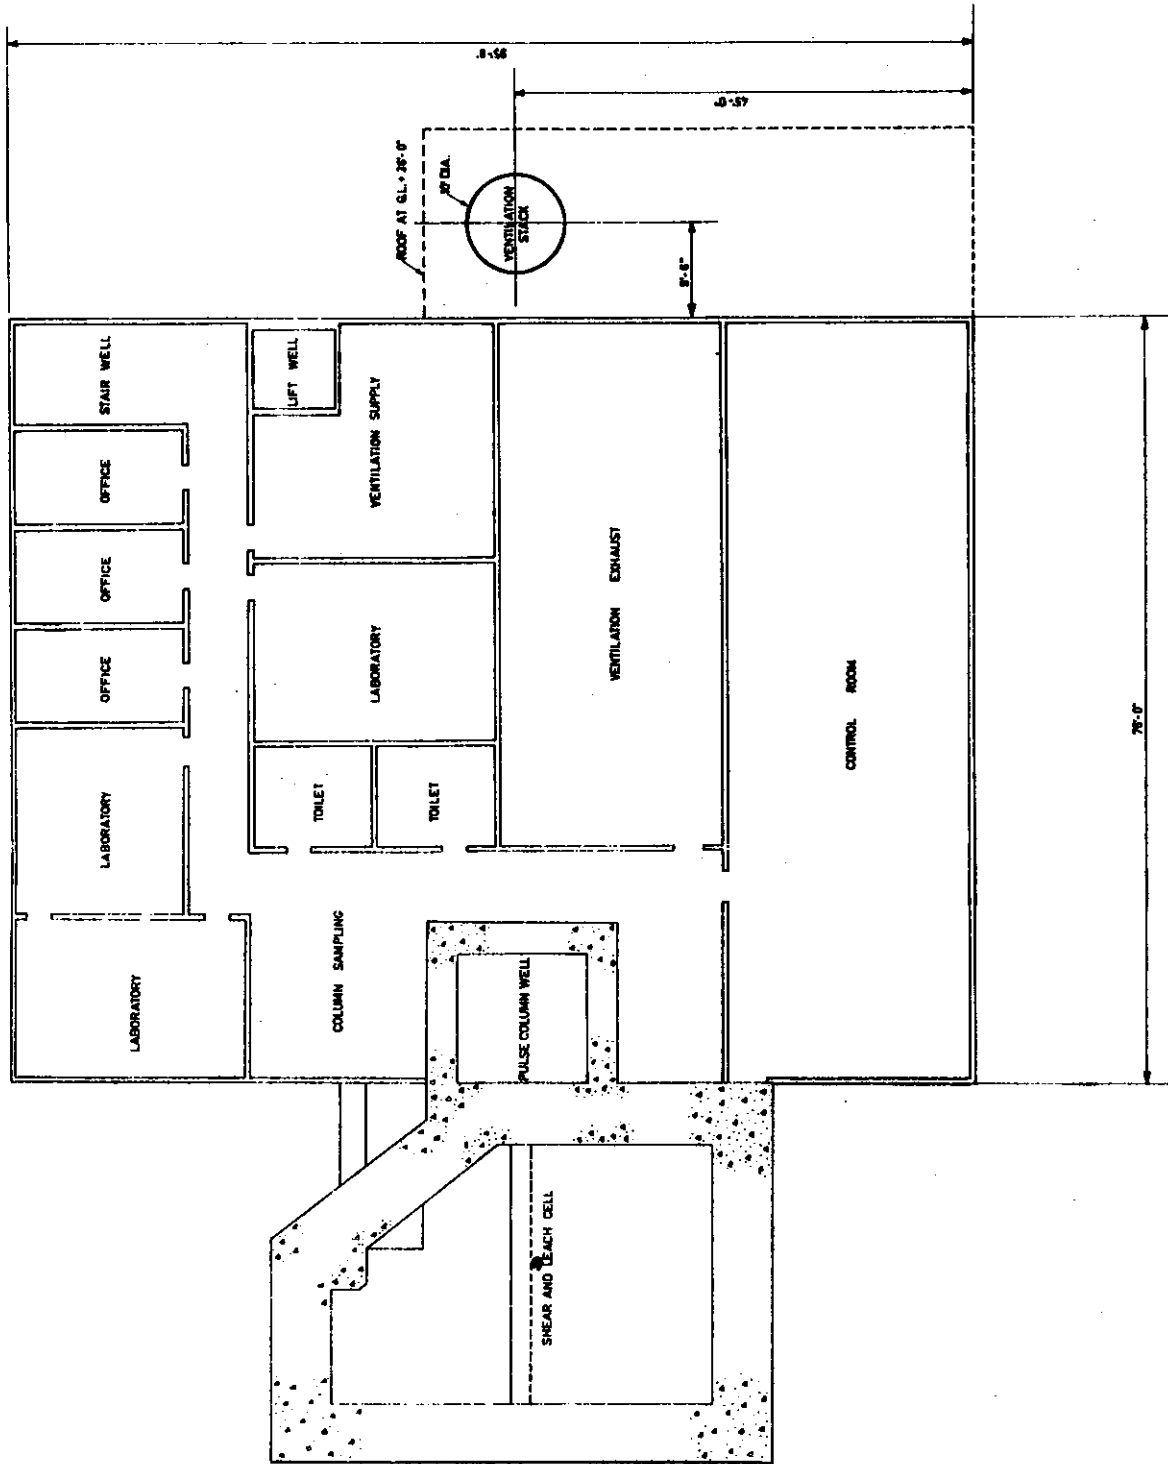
BUILDING DESIGN - PLAN 36 ft TO 50.5 ft
